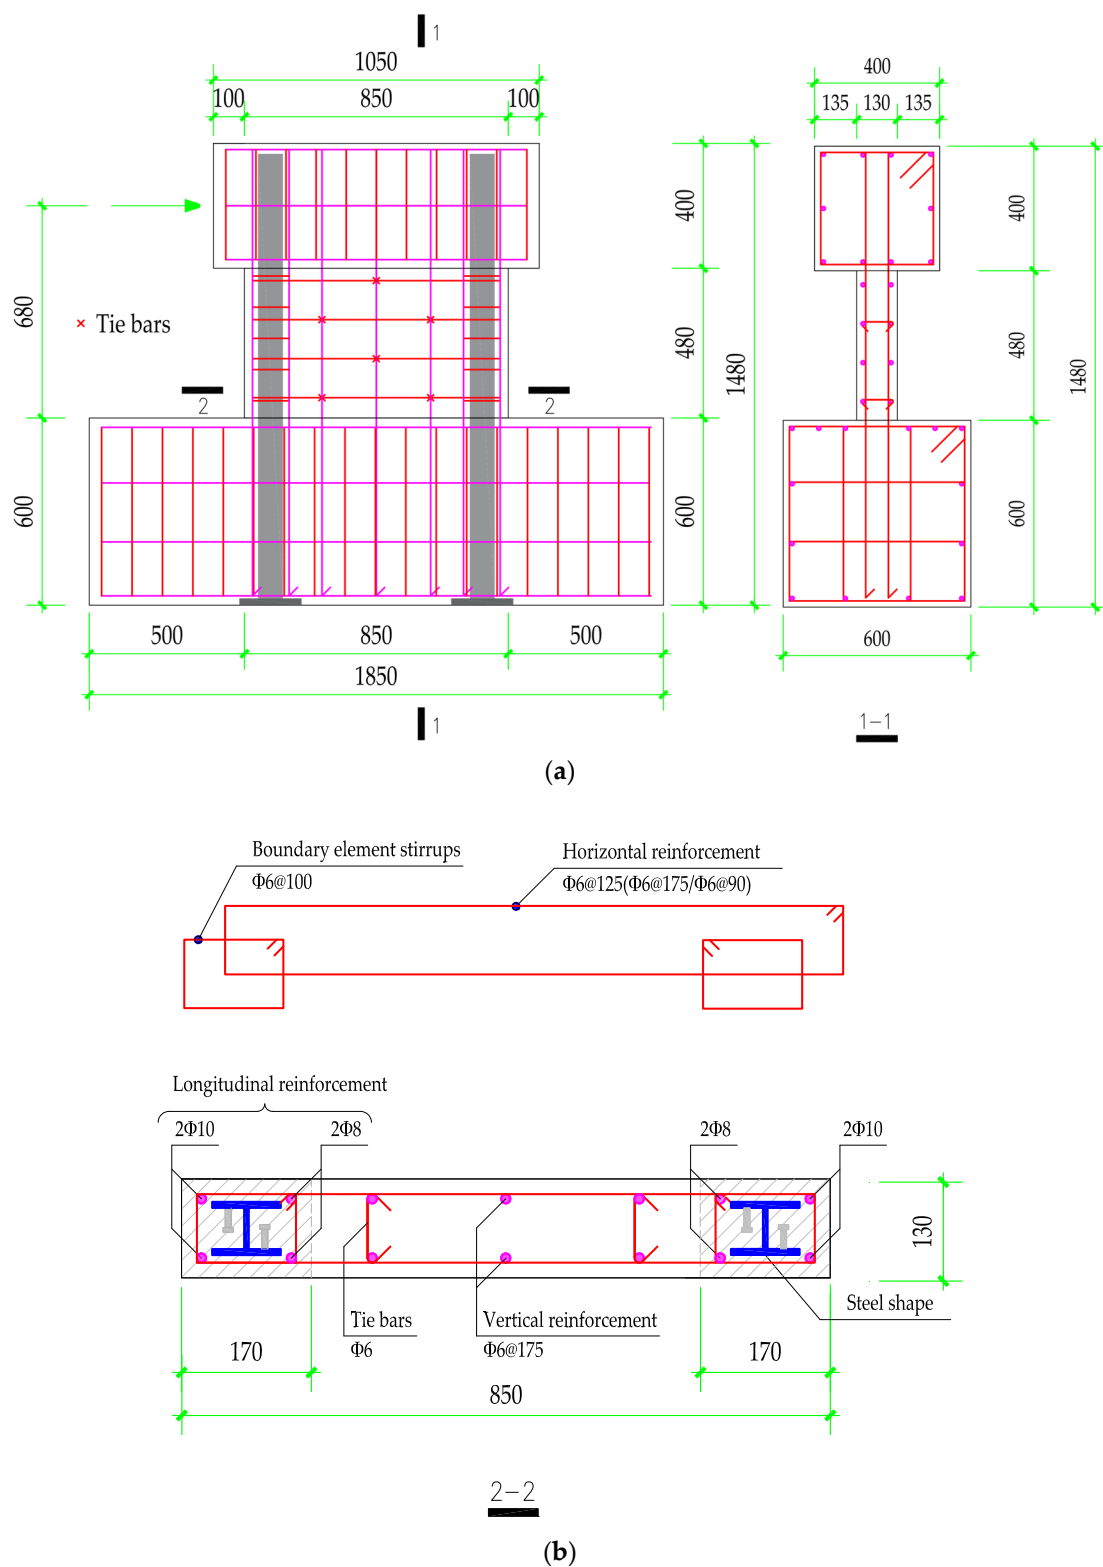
Specimen size and section reinforcement: (a) front and side views of the specimens; (b) cross-section.
